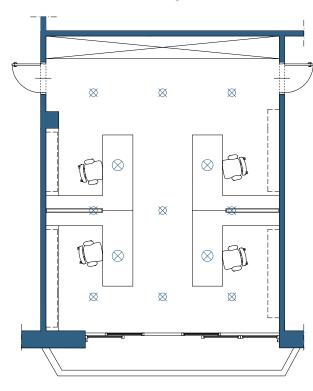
measuring plans positioned inside the room, at 0,85 m height above floor.
